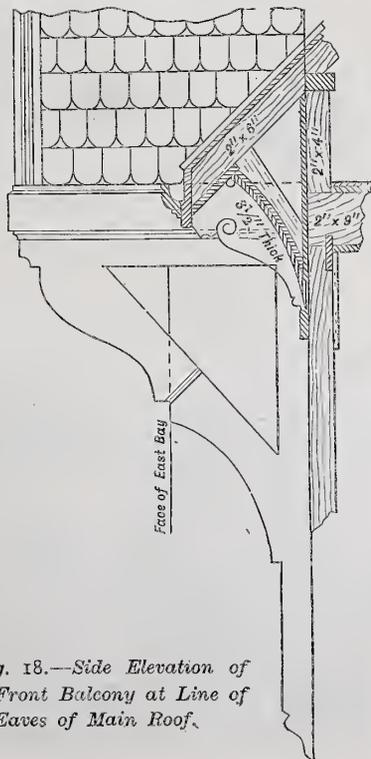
Side Elevation of Front Balcony at Line of Eaves of Main Roof.
